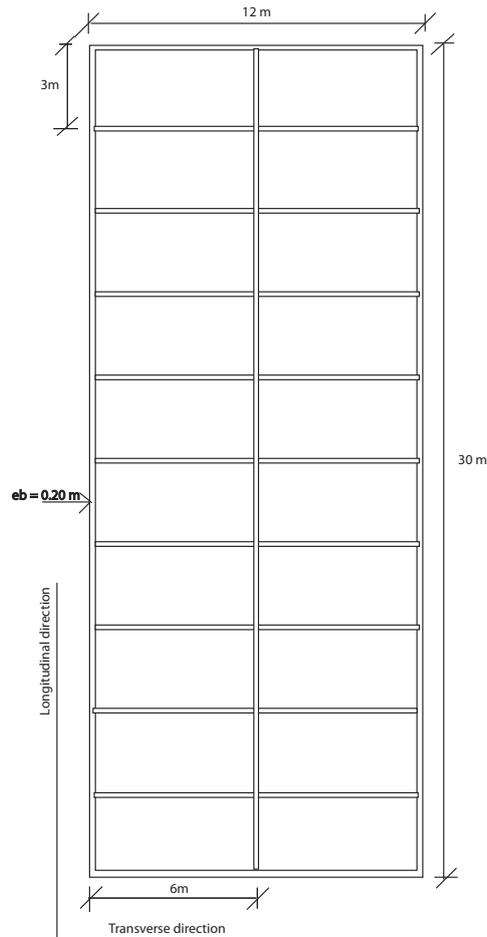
Plan arrangement of the schematic building: 30 m long, 12 m width
